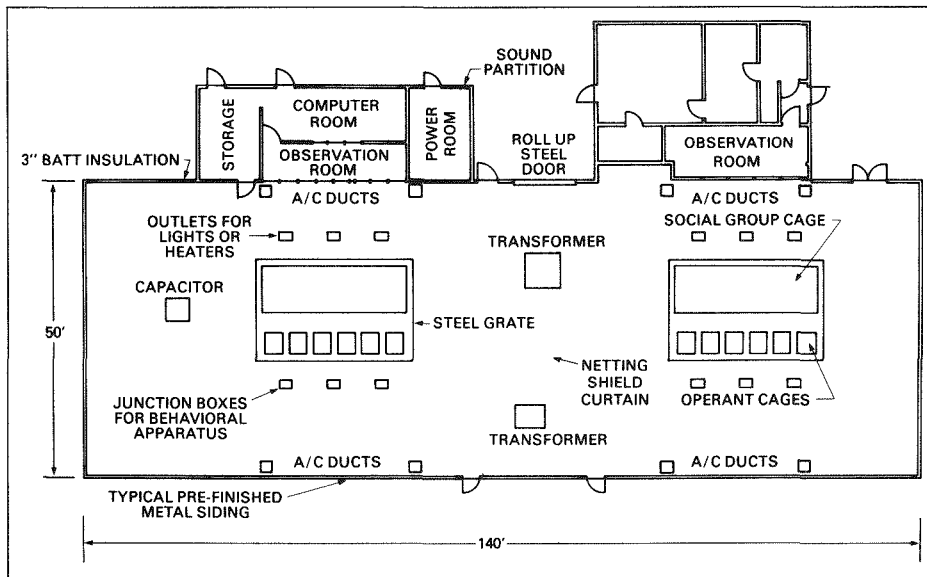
Floor Plan of the High-Voltage Primate Exposure Facility.
